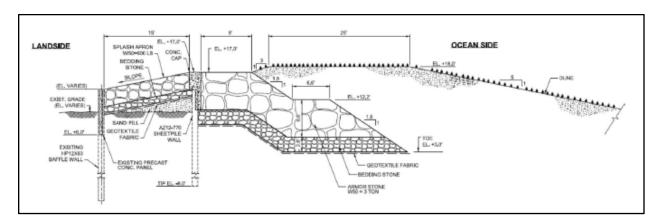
Composite Seawall Design—Beach 126th Street to Beach 149th Street. Illustration credit: USACE (2018a)
